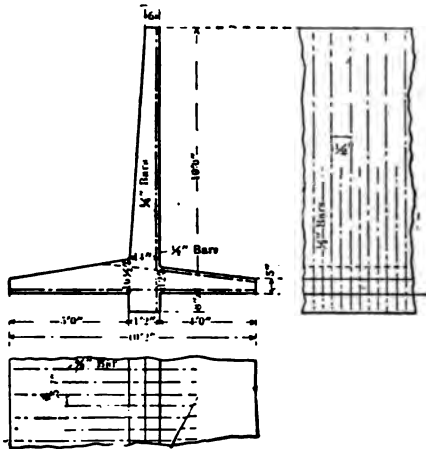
Retaining Wall, American Oak Leather Co. Building, Cincinnati, O.
